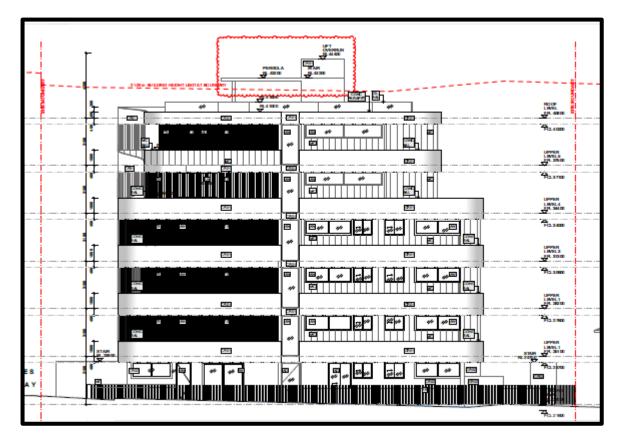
Extract of western side elevation of the subject site which will face the northern side elevation of 198-200 Princes Highway, Kogarah Bay. Levels 4 and 5 comprise of living rooms and screened balconies (Source: Bureau SRH, 2020).
